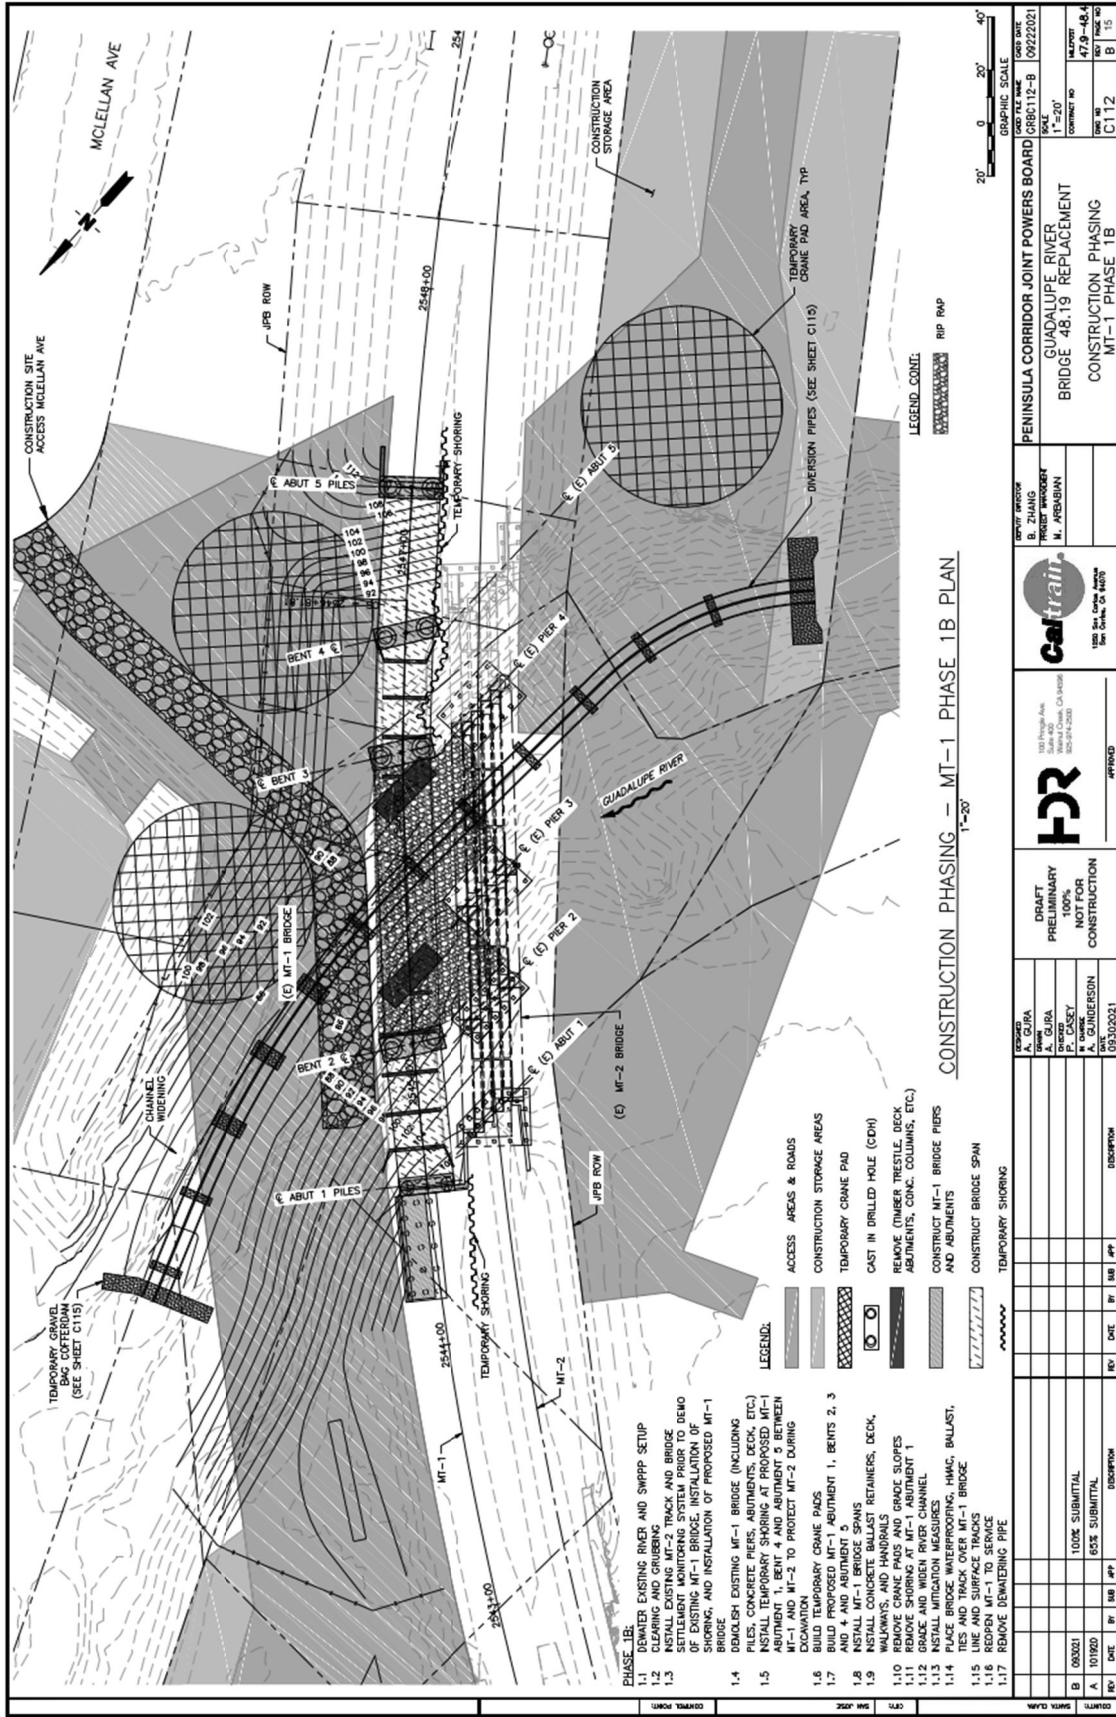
Construction Access Plan in 2021 100% Design: Sheet C112
